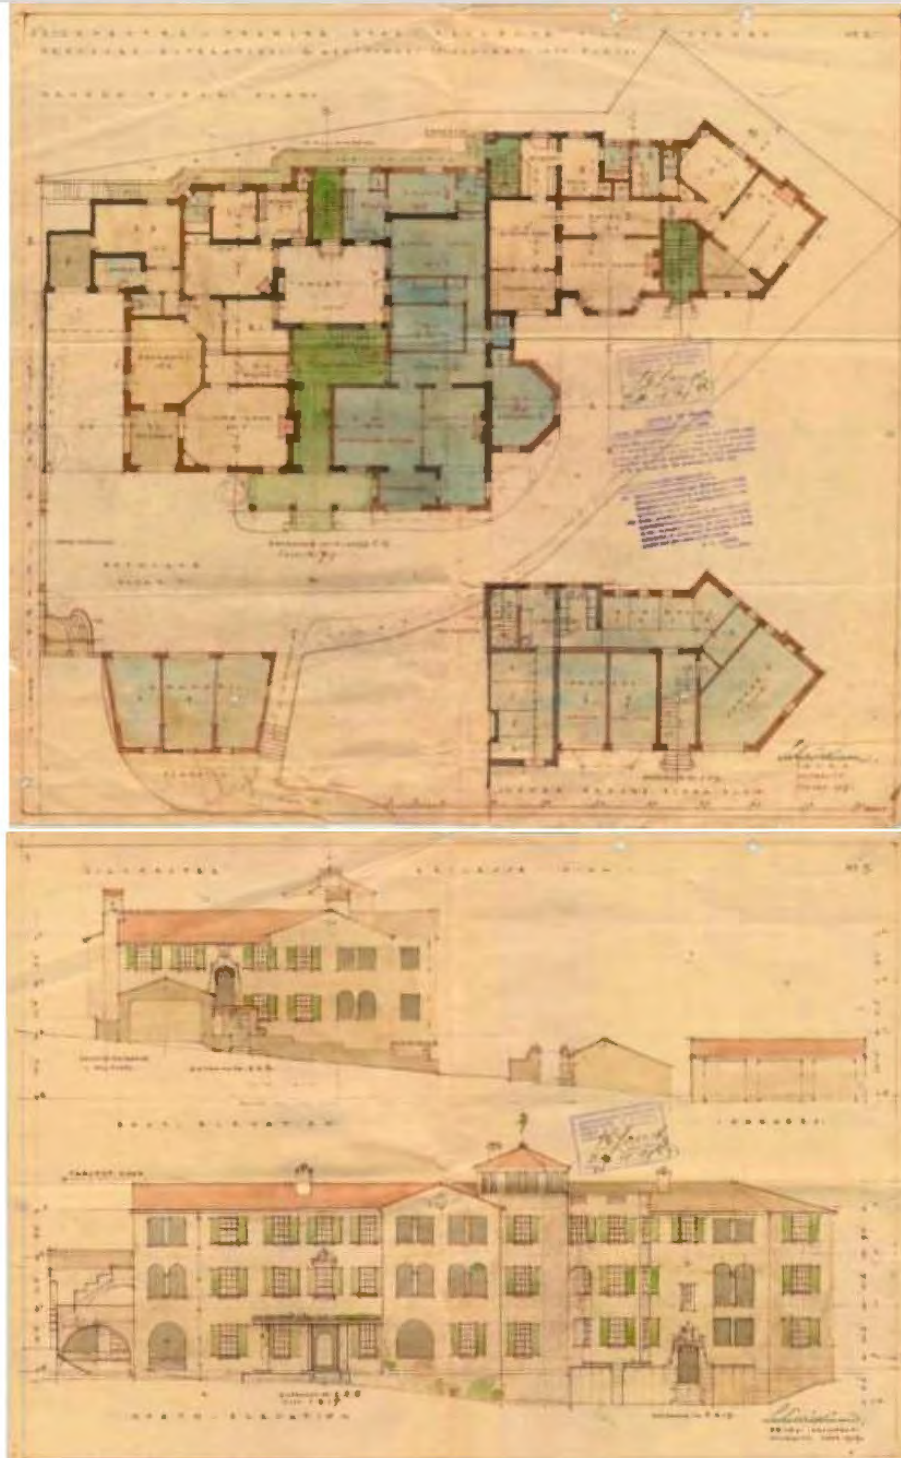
Architectural plans lodged with BA379/1929 (Woollahra Records)
